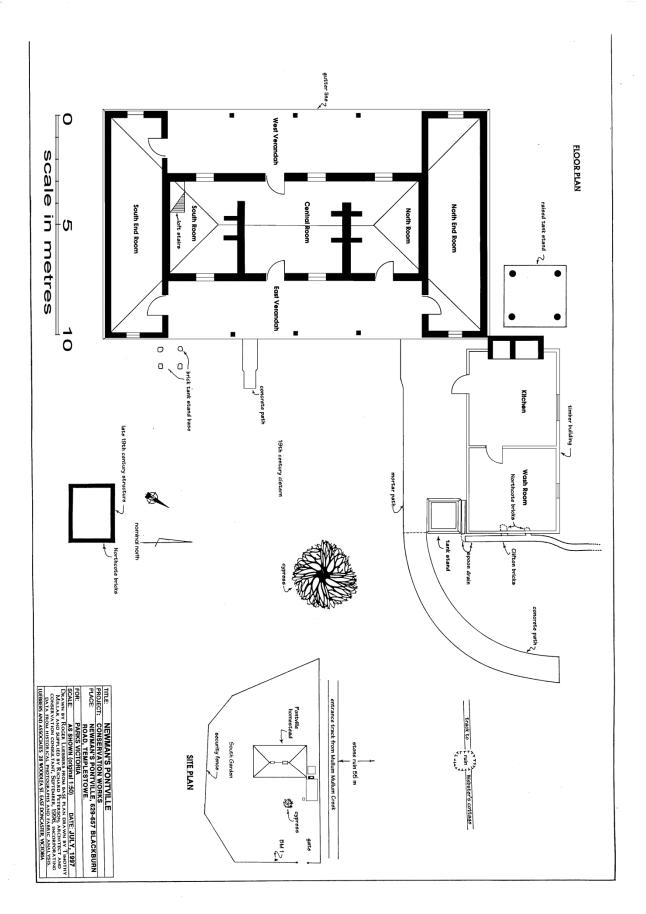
Site Plan of structures in Pontville Homestead precinct.
